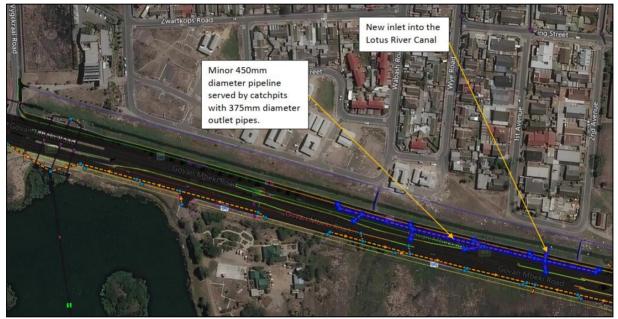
Proposed Minor Stormwater Drainage System (2) (source: GIBB, 2021)
